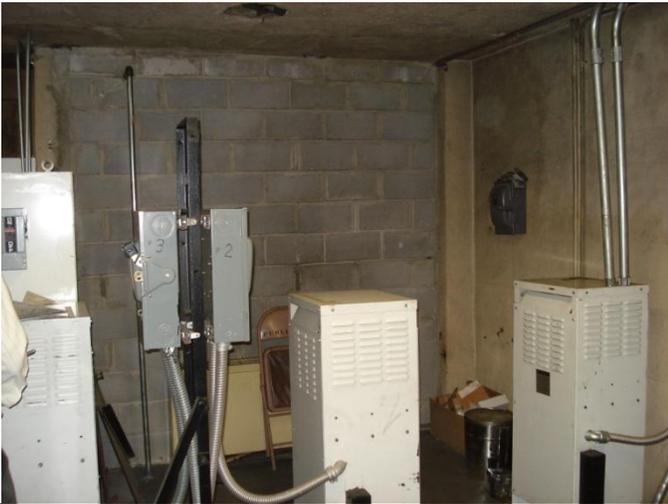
Upper Elevator Machine Room; view of unused shaft closed in with CMU; also seen is various electrical and control equipment boxes.
